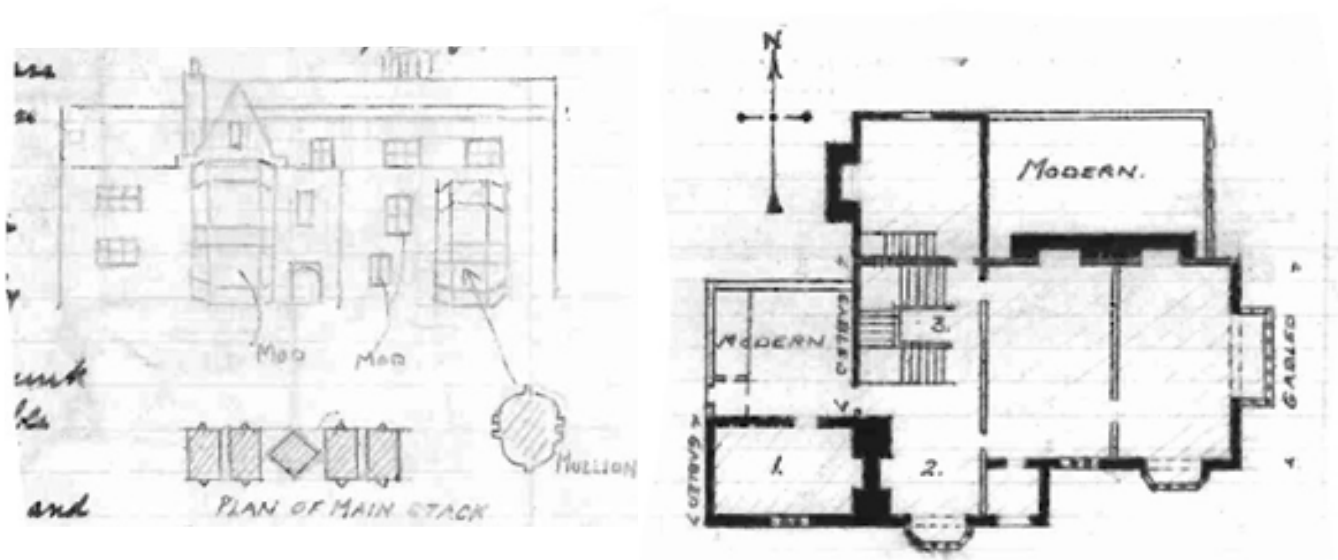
Edwins Hall, Sketch elevation and plan from 1932 Royal Commission Surveyors notes
